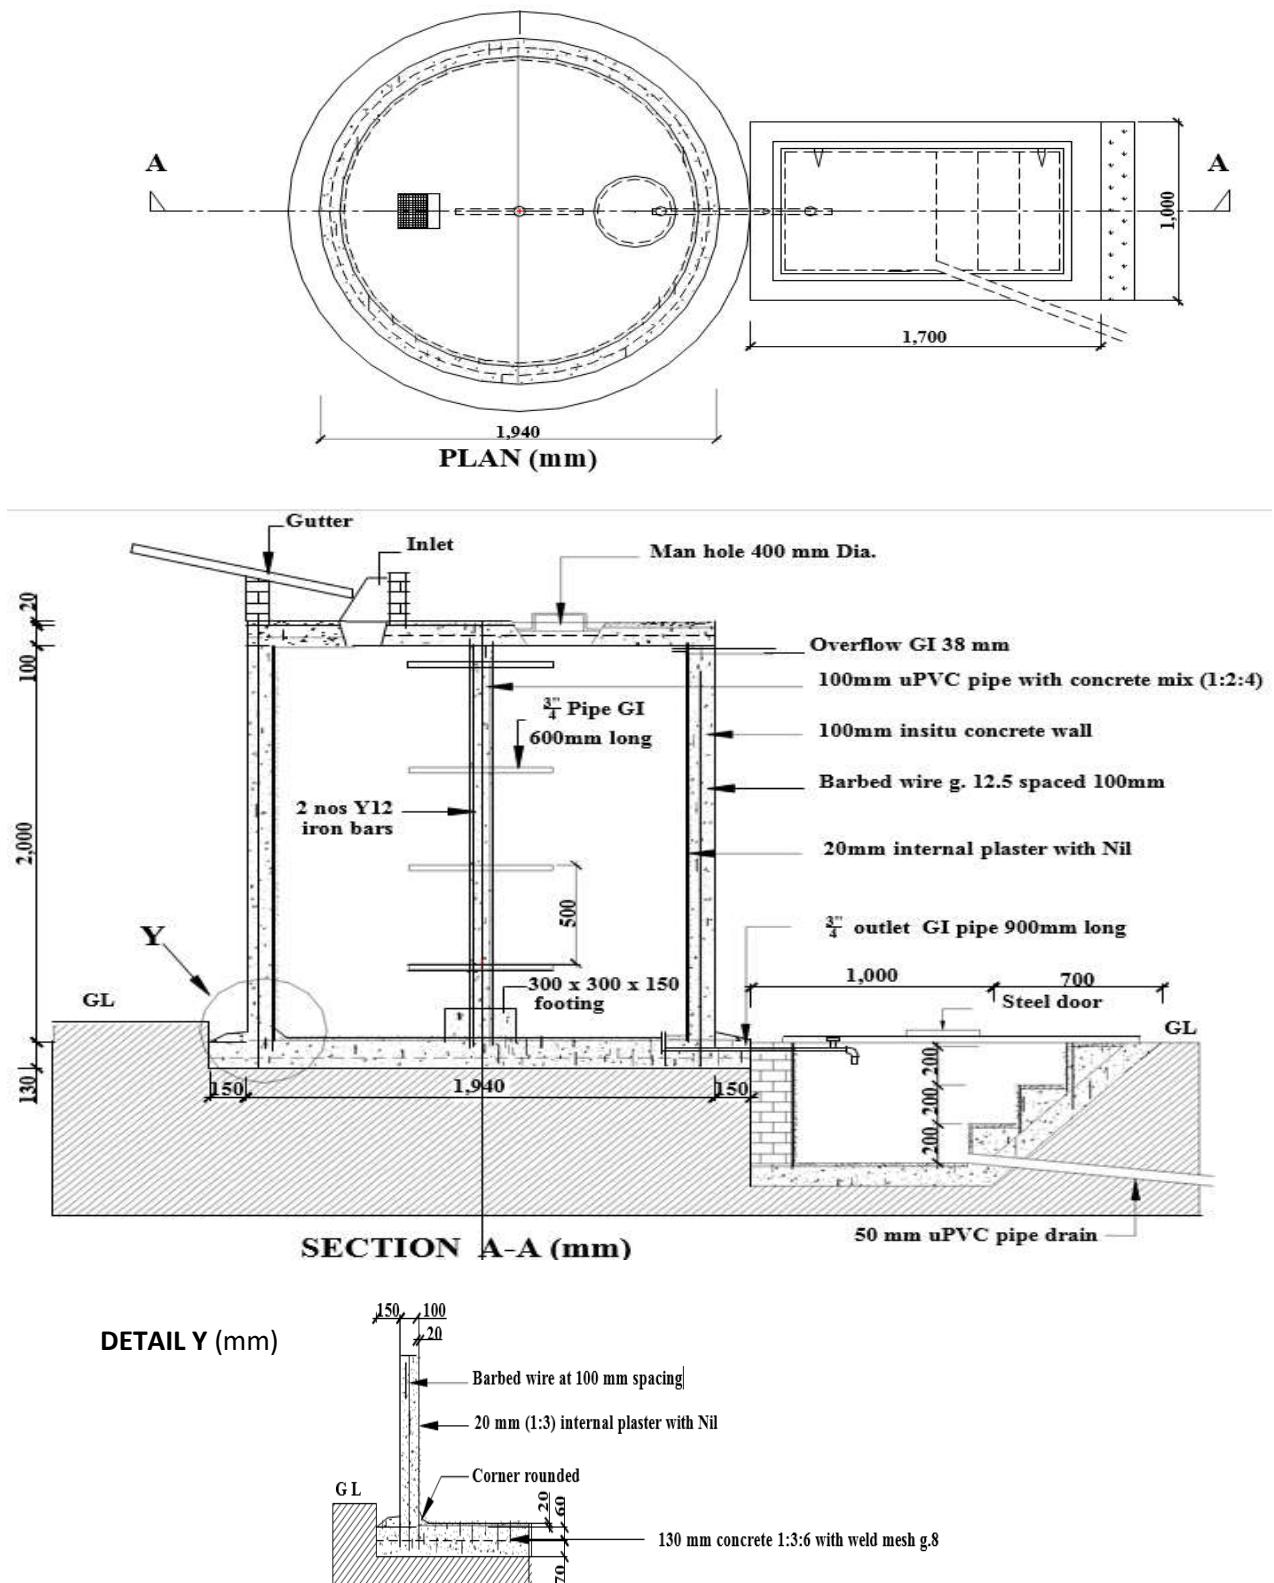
Standard design for a 5 m³ tank built of concrete in situ
